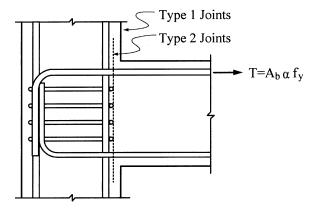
Critical section for development of beam longitudinal reinforcement terminating in the joint.
